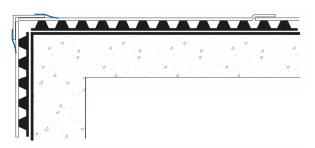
Overlap geotextile on top of adjacent Deckdrain cores and butt cores together at roof base / wall corners using NW8 geotextile strip and seal with jointing tape
